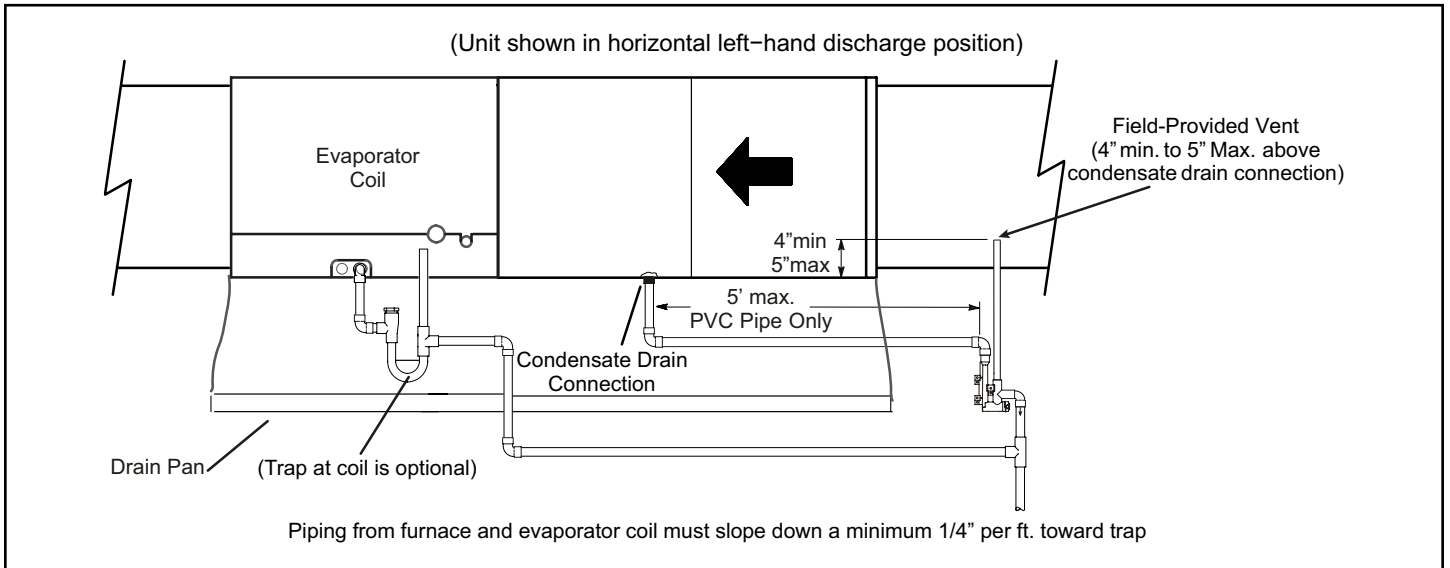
Furnace with Evaporator Coil Using a Common Drain
